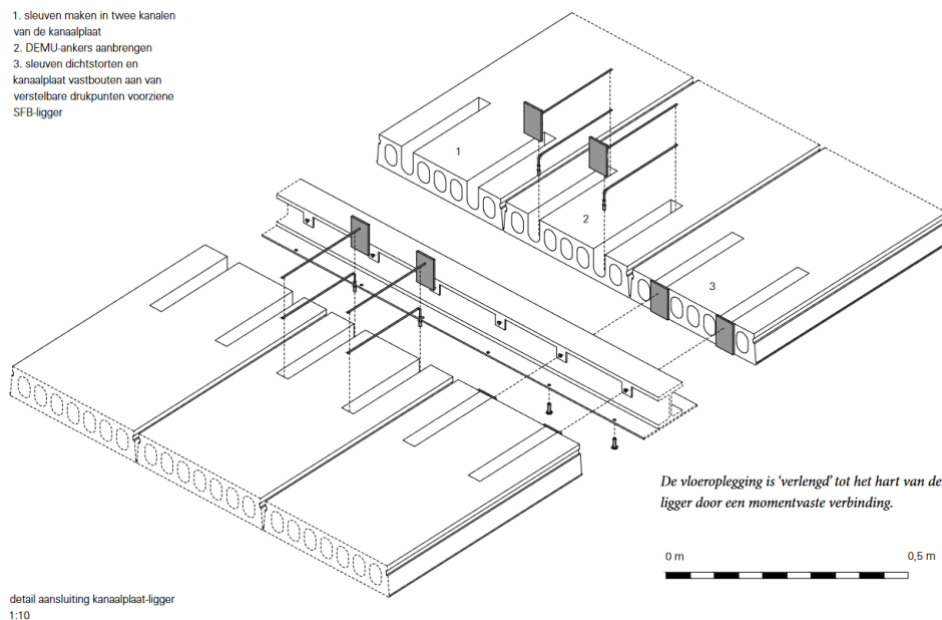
Connection detail with bolted demountable shear connector (exploded view)
